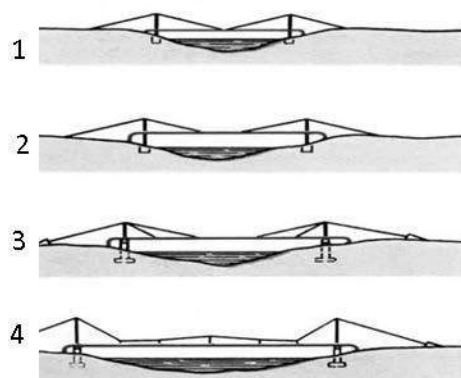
Scheme of the cable-stayed suspended pipeline: 1, 2, 3 - with inclined cables; 4 - with cable girder.
